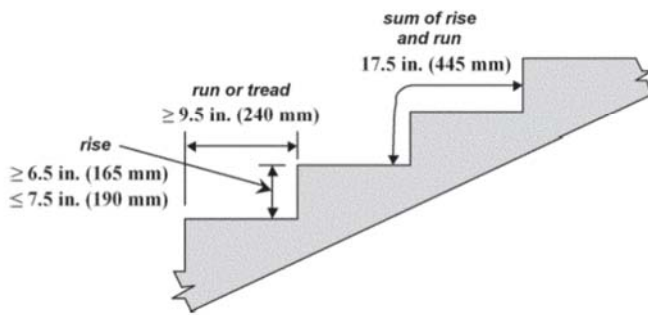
Maximum step rise and minimum step rise and thread in stairways.
